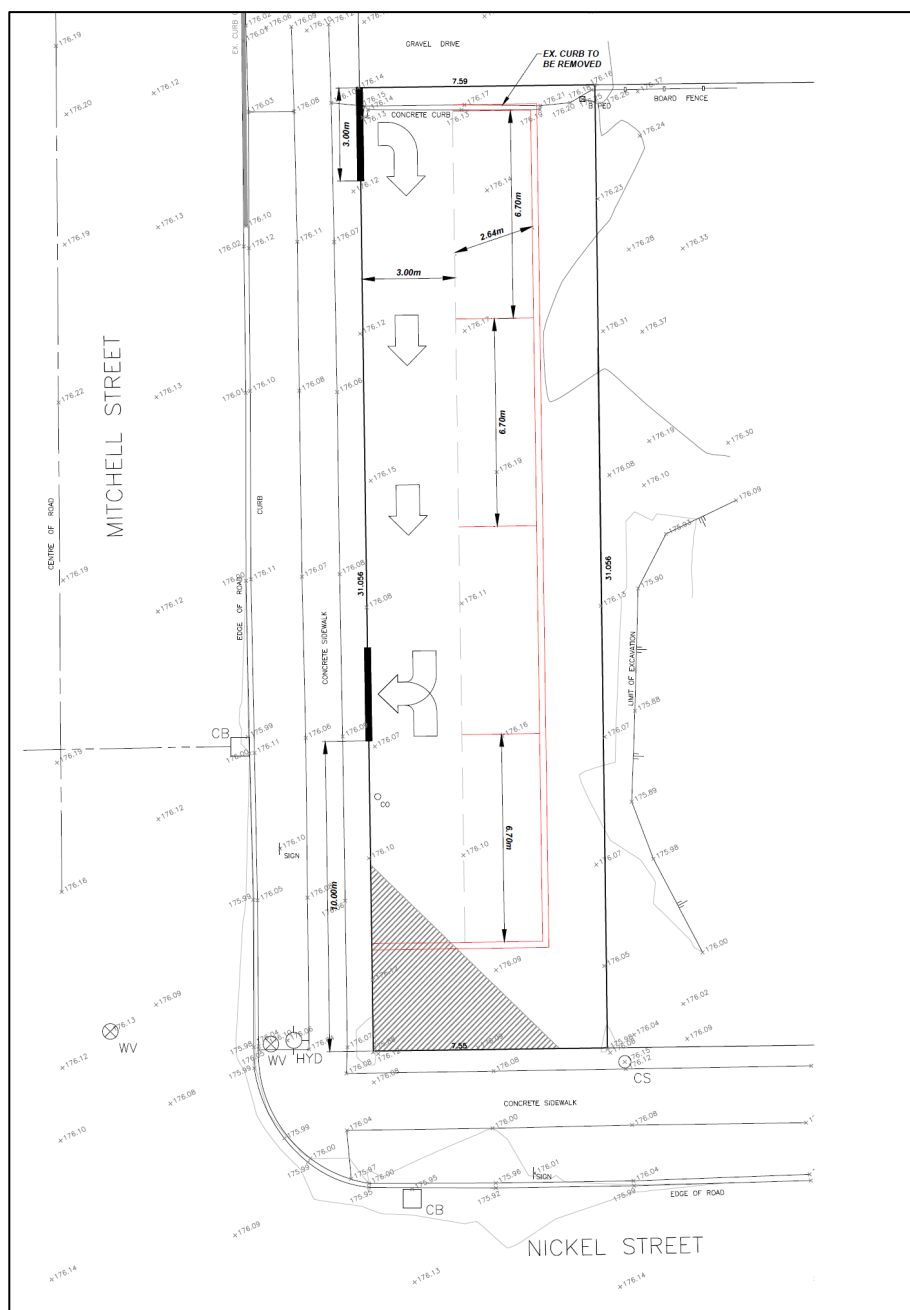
Off-site proposed parking plan for 174 Mitchell Street
